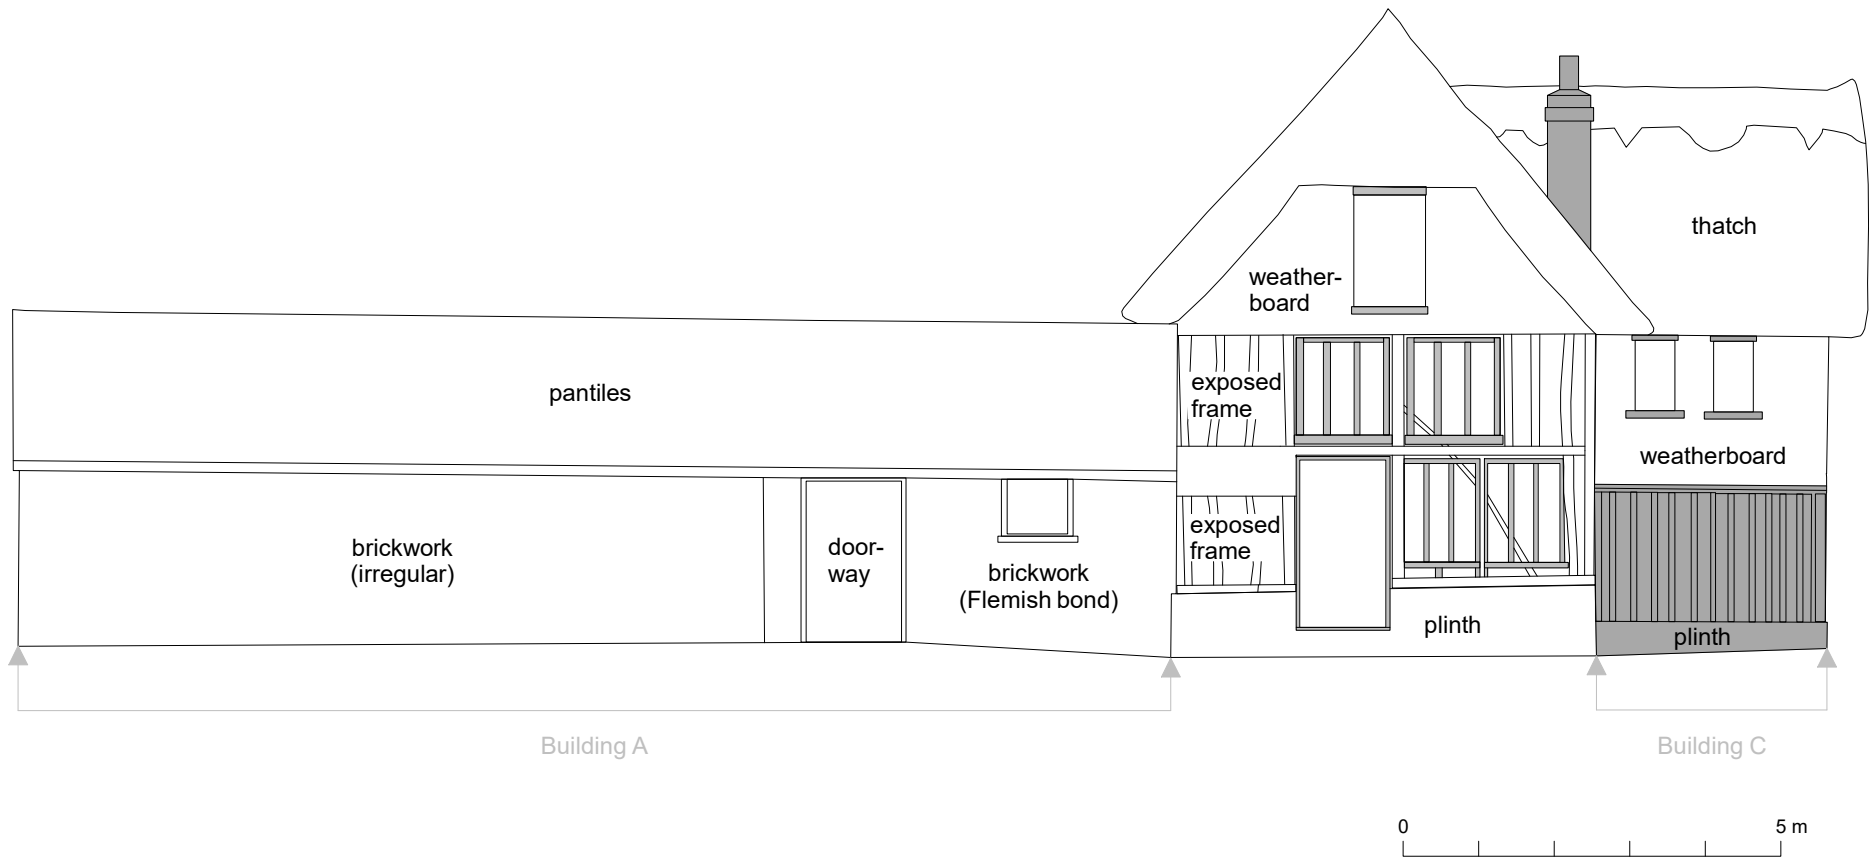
Western elevation of barn and Building A and C. Modern additions shown in grey.
